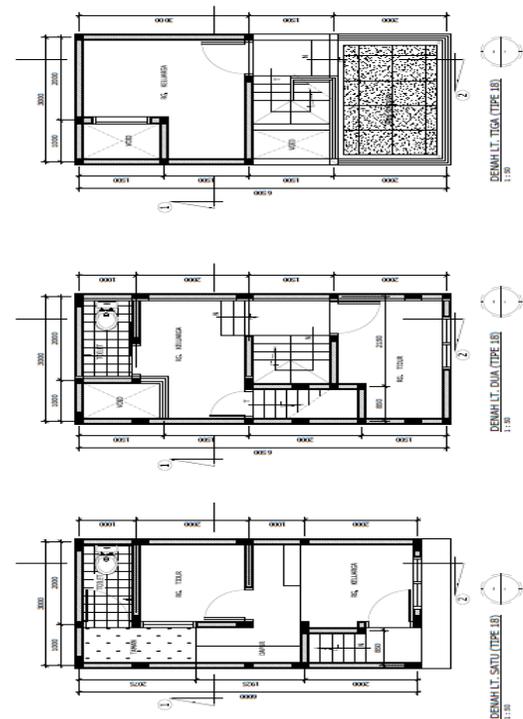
Floor plan 1, 2nd floor, 3rd floor, type 18 house
